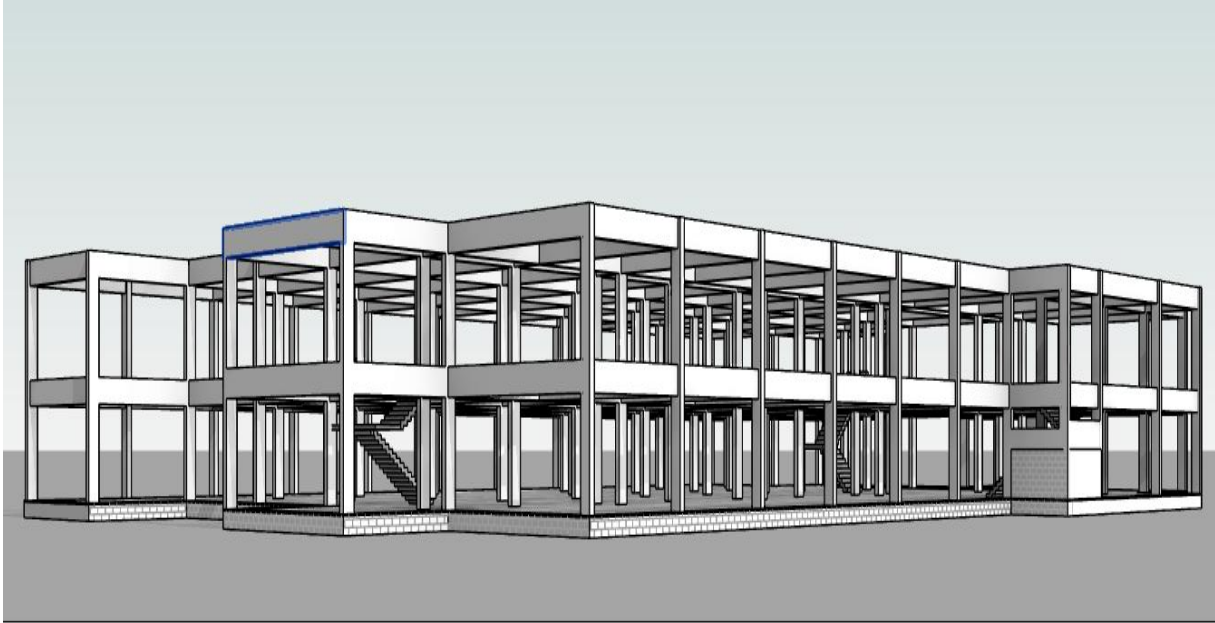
ProtaStructures design showing Design Status of Structural Plan And 3D Model for the Study Building (Storey 1)
